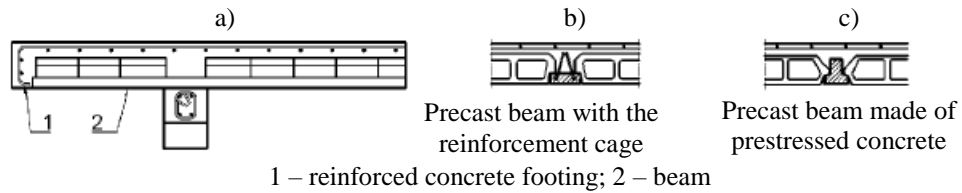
Structural solution for a cantilever overhead of a slab with precast prestressed girders protruding as cantilevers:
